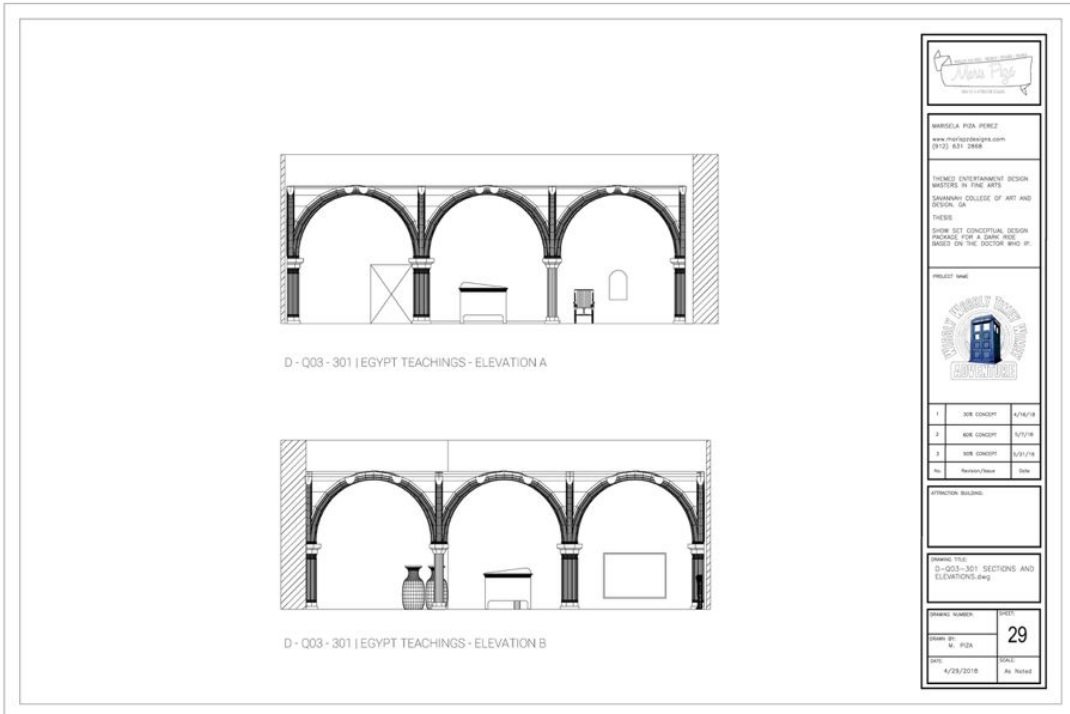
D-Q03-301 | Egypt Teachings - Sections and Elevations
